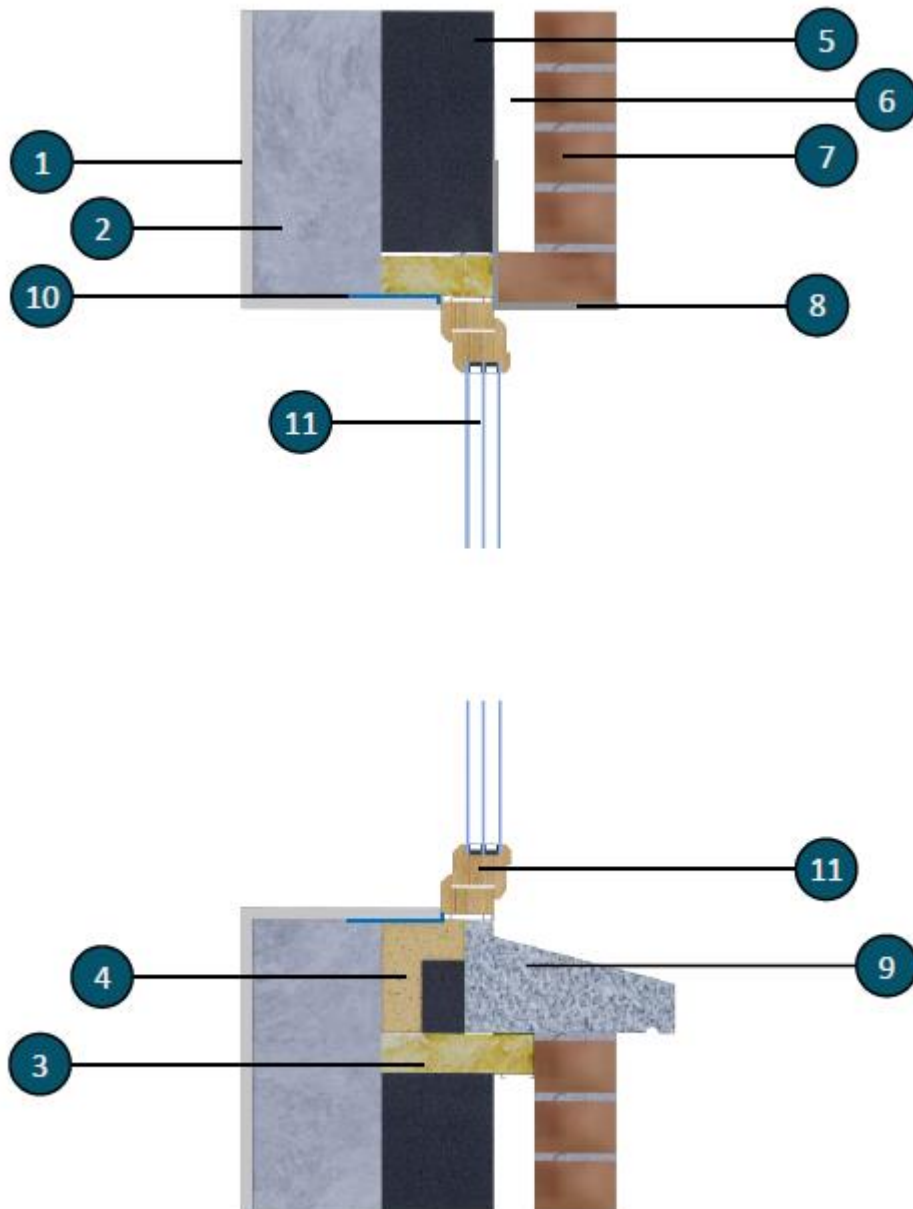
Window head and sill detail – traditional brick/block outer leaf cladding
